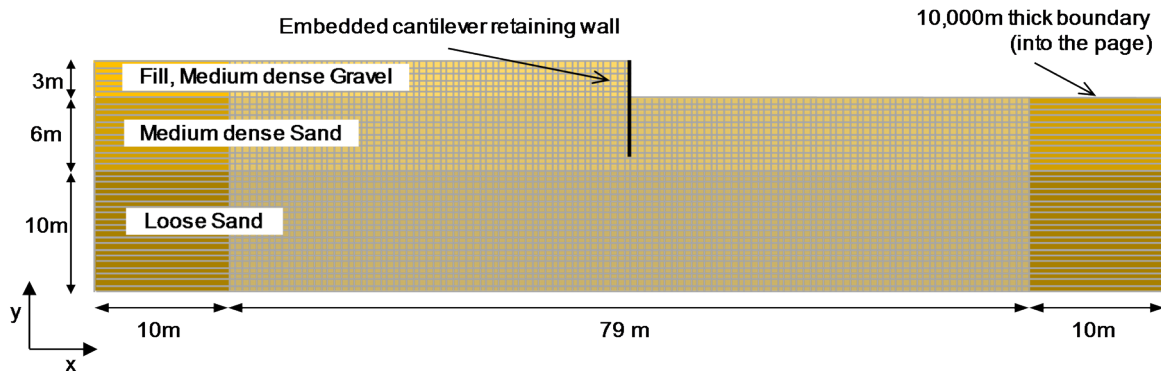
Example of Class D embedded cantilever wall in OpenSees.
